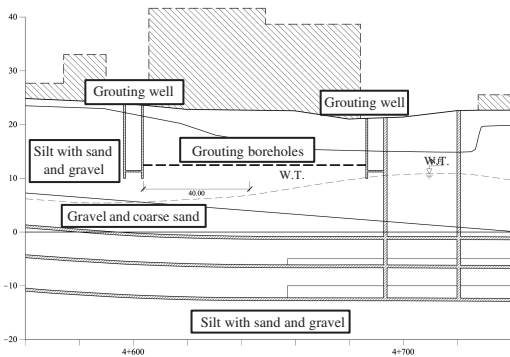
Compensation grouting performed at the Juan Valera road zone. Cross section.
